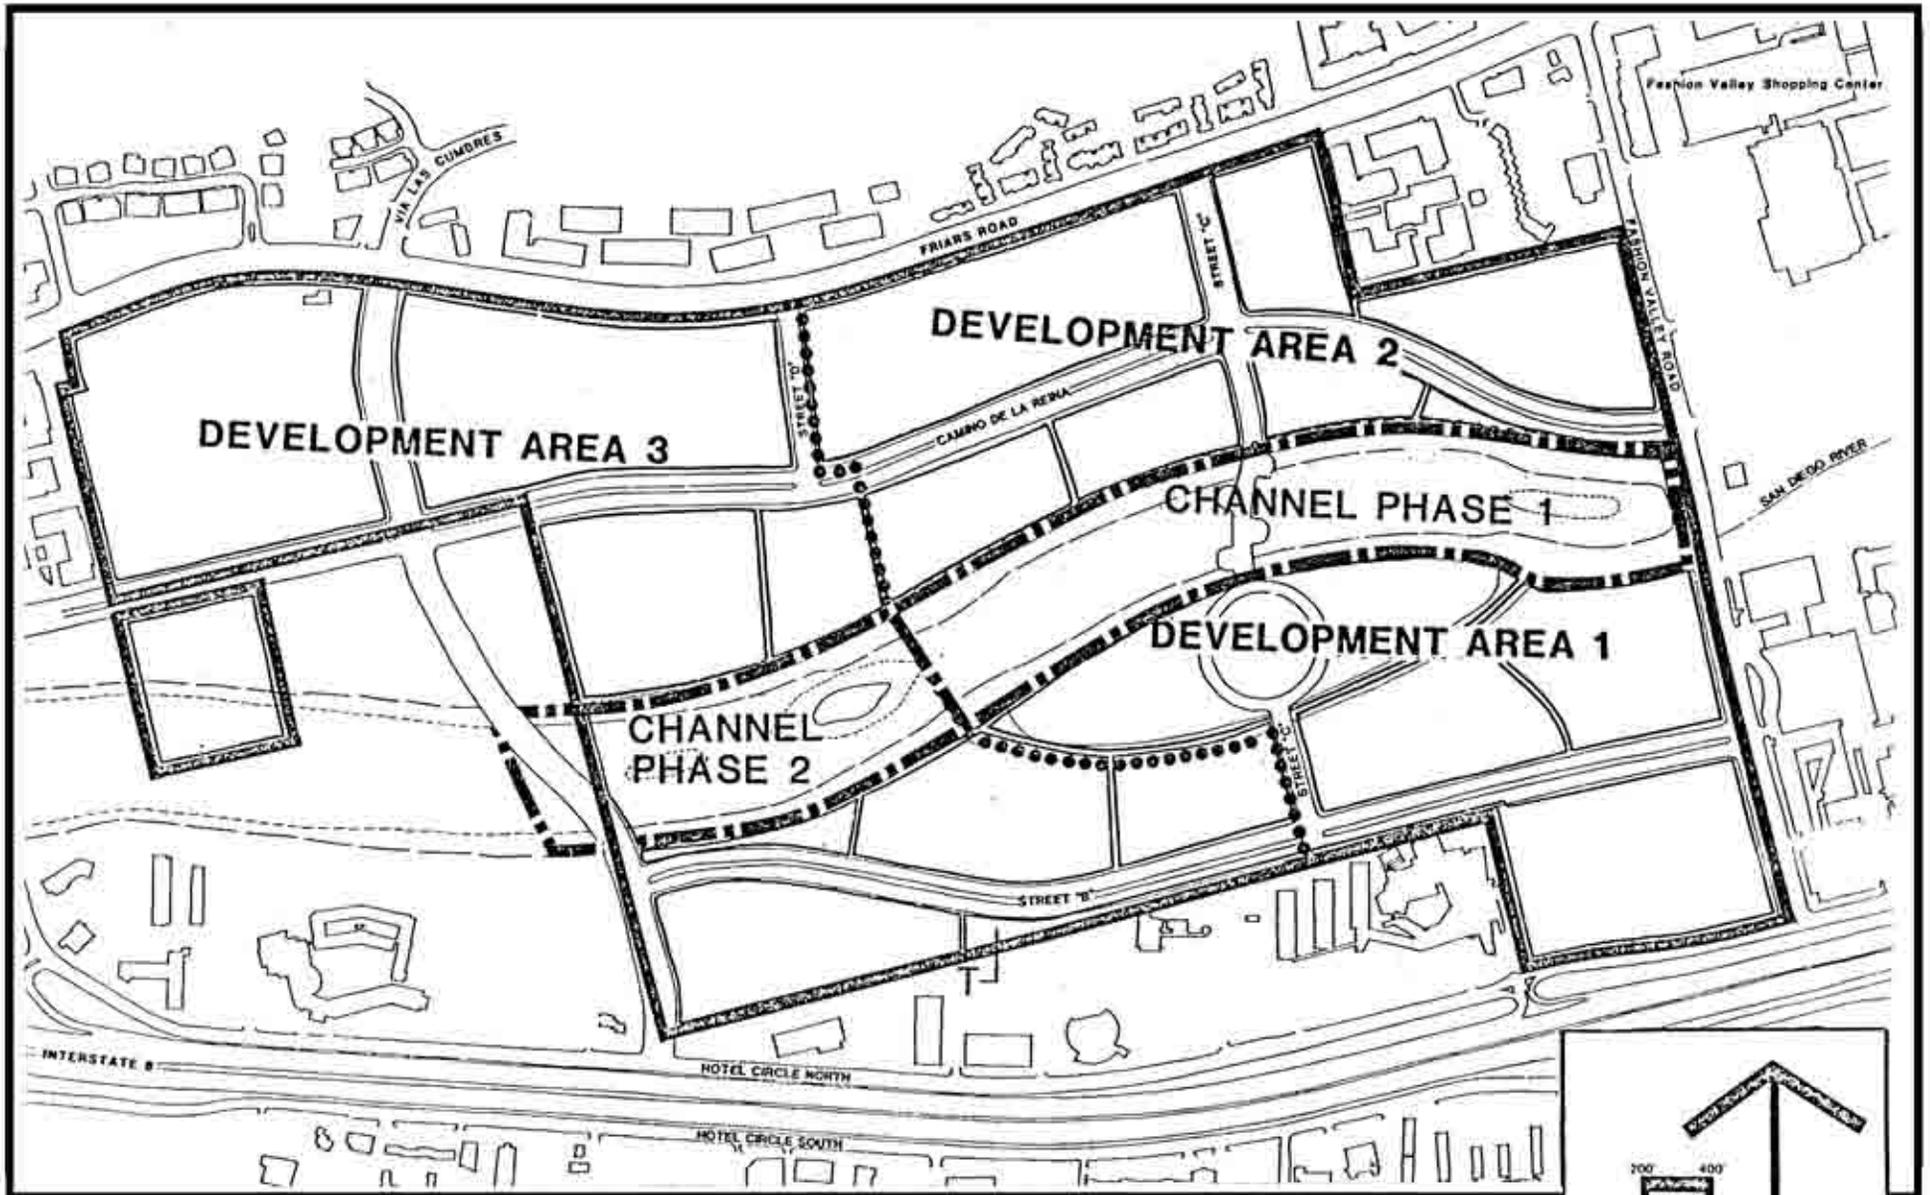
PROPOSED CHANNEL CONSTRUCTION AND REVEGETATION PHASE ON THE LEVI-CUSHMAN SPECIFIC PLAN
